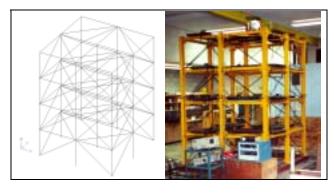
Steel Frame Model, a) FEM wire frame model (left); b) actual unit as tested (right)
